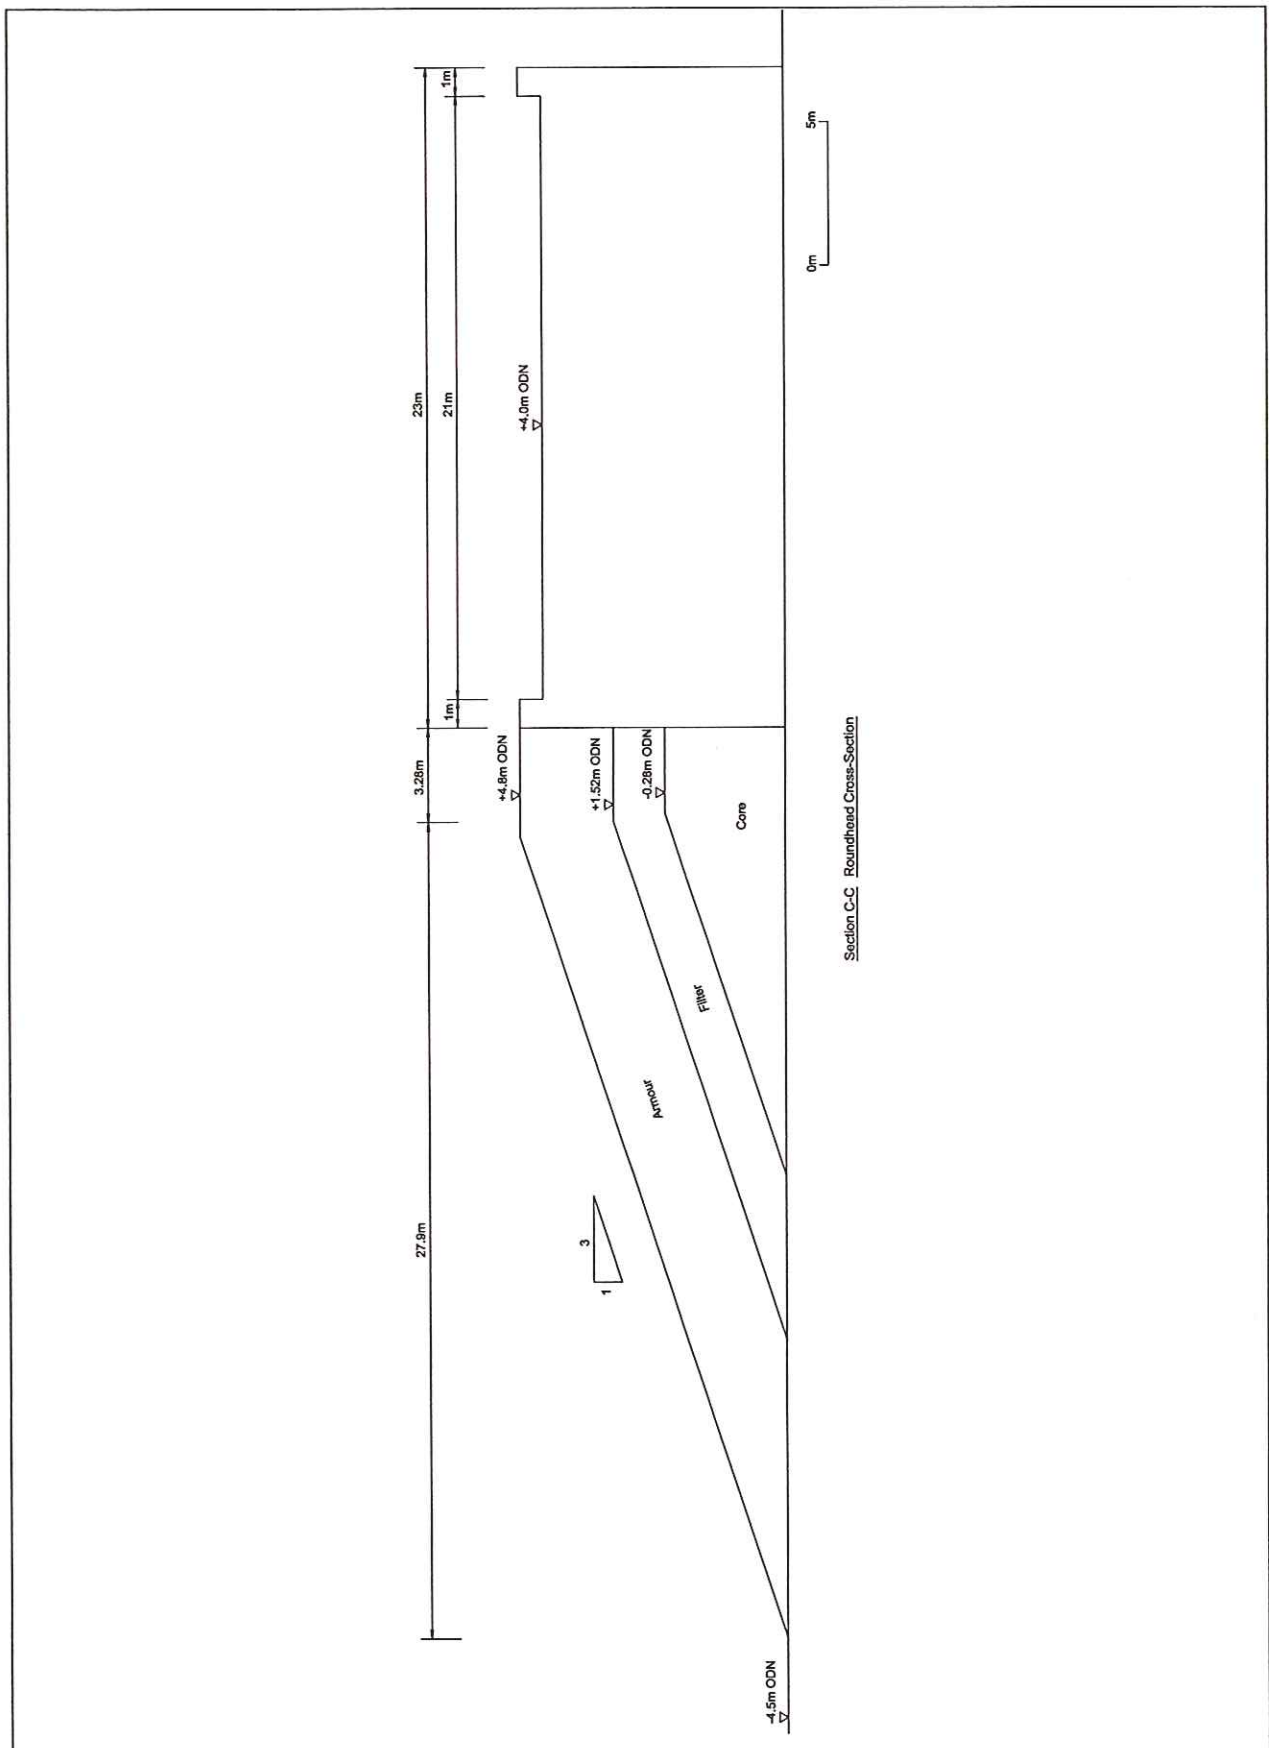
Typical sections through the proposed West Breakwater roundhead, Test Series 3, 4 and 5
